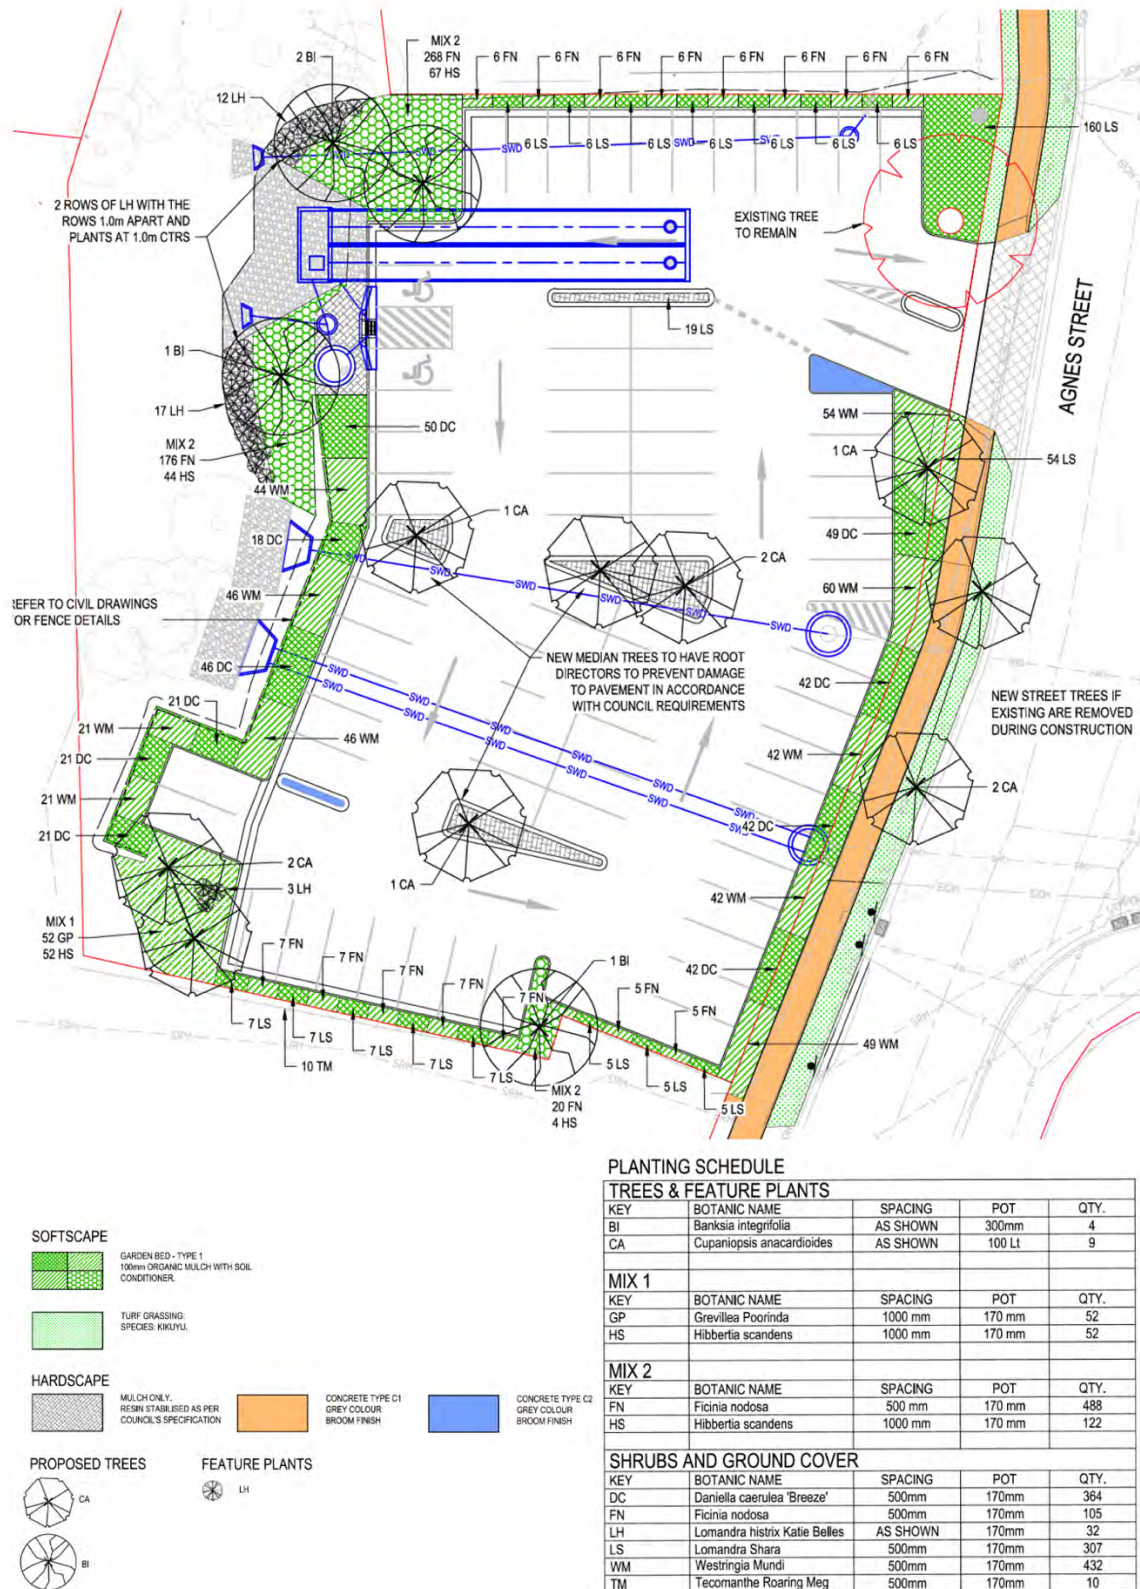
Proposed Landscape Plan (extract adapted from CARDNO drawing R2018073-LA-0100 Rev D)
